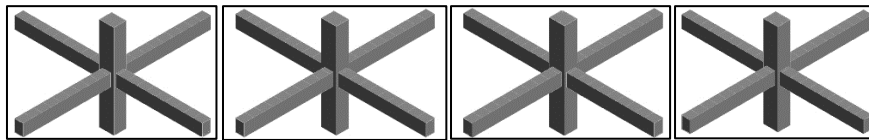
Interior Beam-Column Joint with 10mm, 12mm, 14mm & 16mm Steel Retrofitting.
